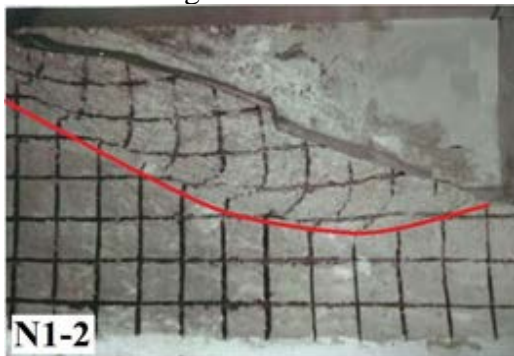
Model No. 1 before testing. There are no retaining structures. Red in color marked the sliding surface
